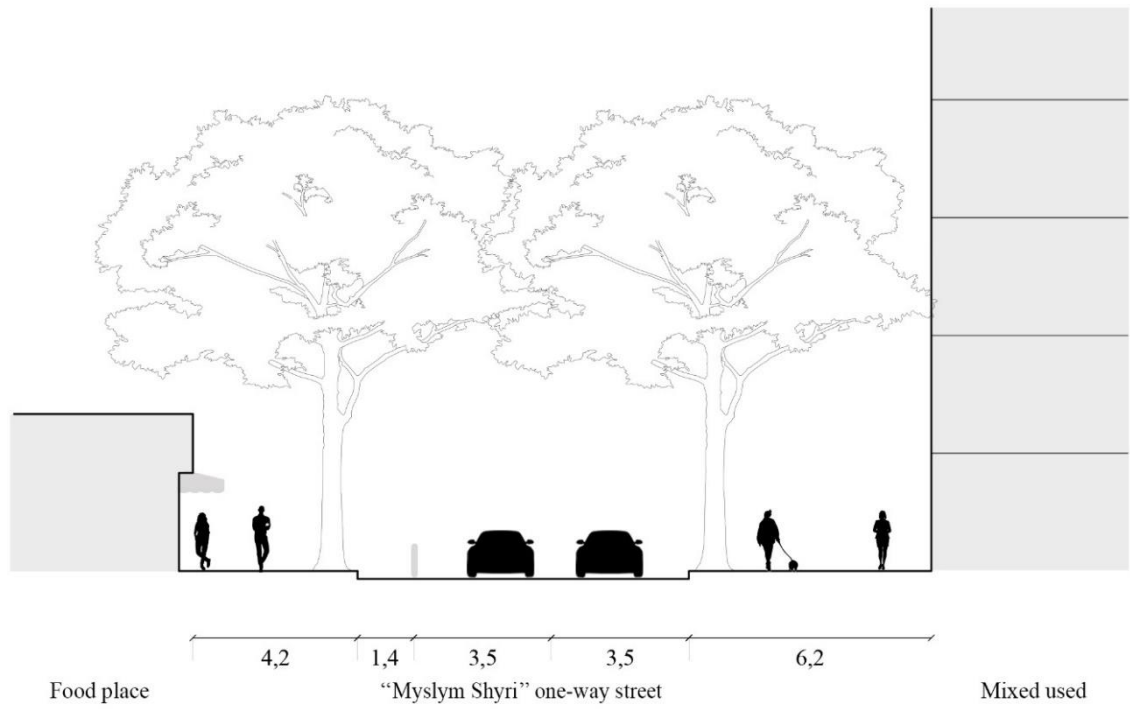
Existing condition of "Myslym Shyri" street showing lack of resting elements
